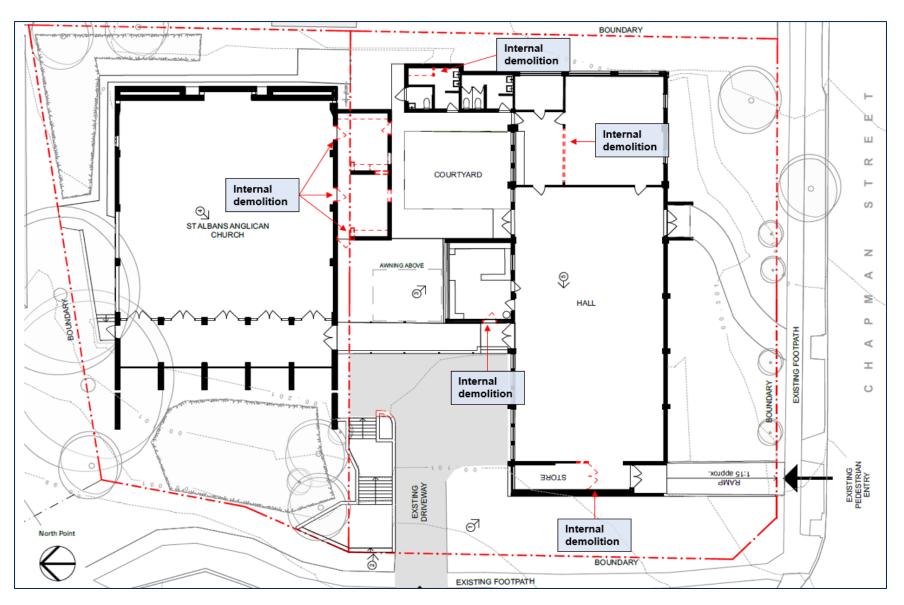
| Proposed internal alterations and demolition works (Source: Applicant's EIS)
